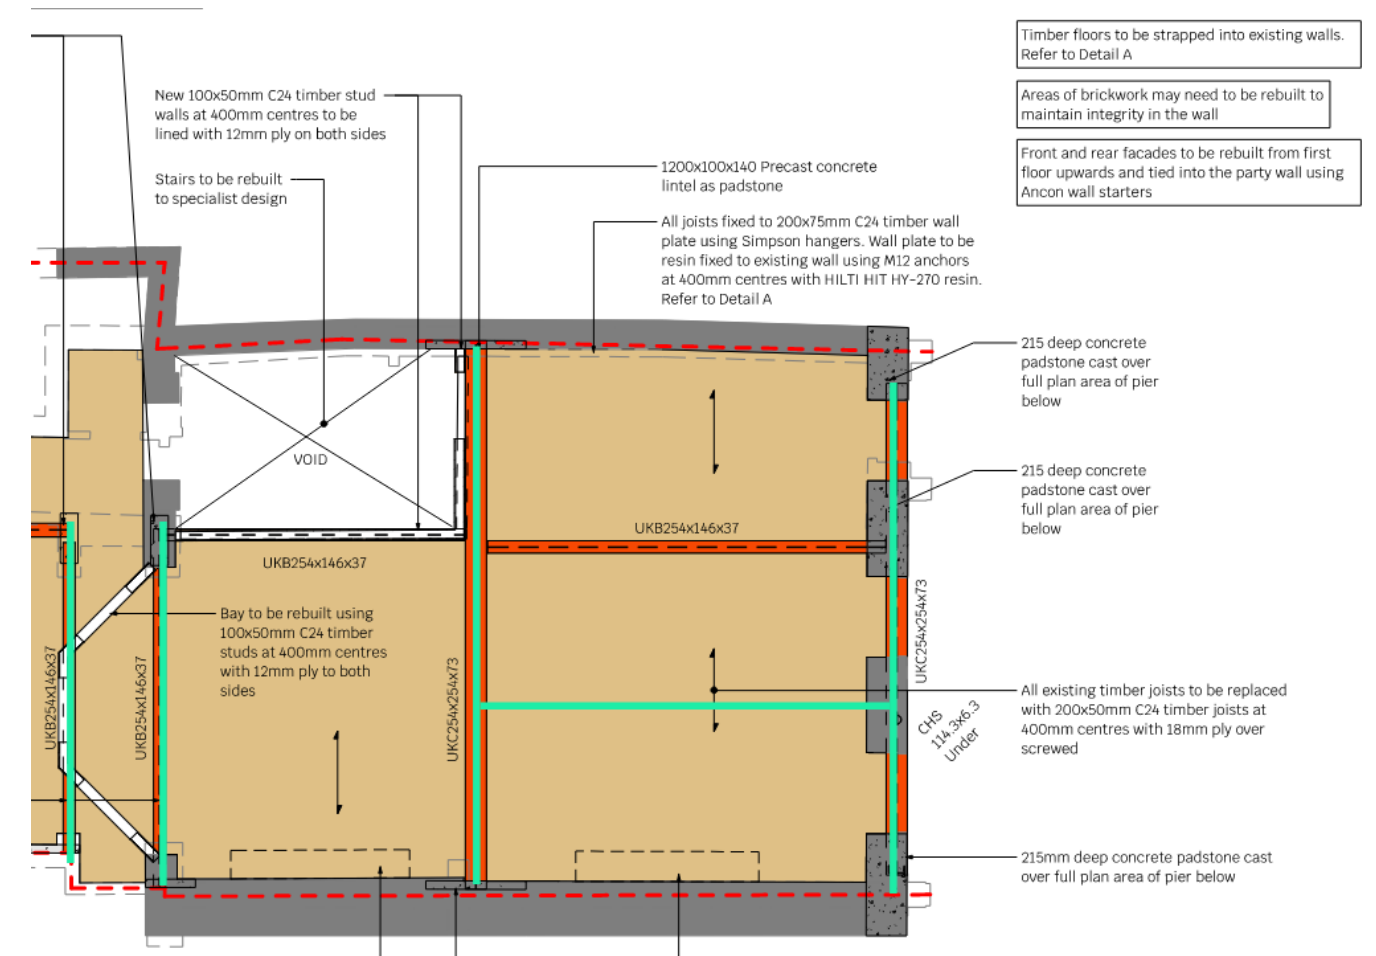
Proposed First Floor Plan - existing timber bressummers shown in green (layouts similar above)
